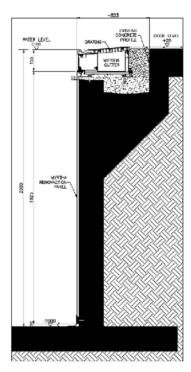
the above shows a section through 50m meter pool at Northcote in is final condition. The thin wall panels are shown and a Myrtha wet deck gutter over the existing concrete pool wall.
